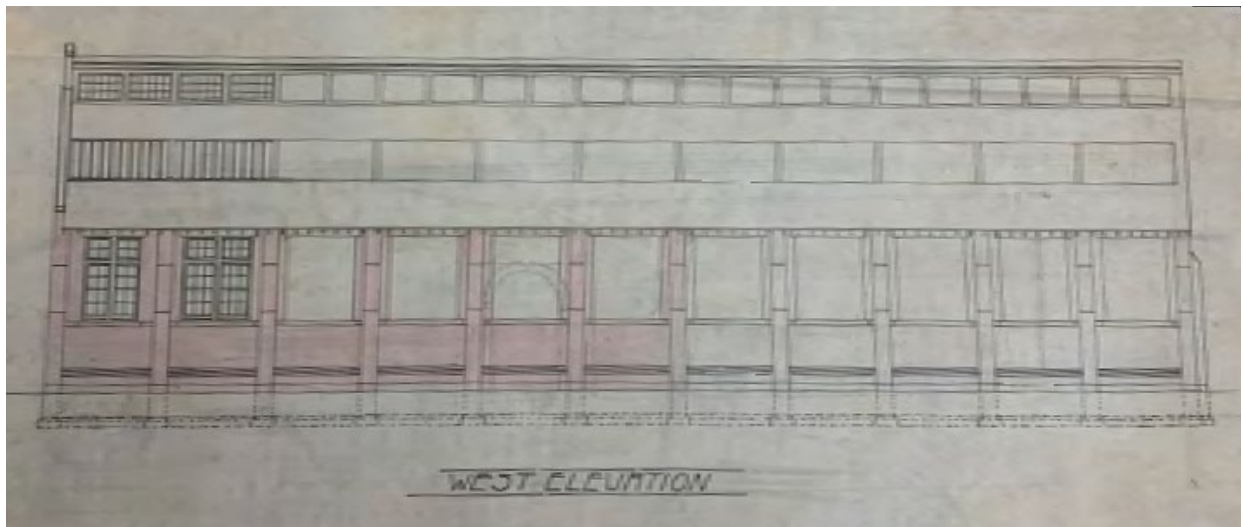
1896 original drawing by EJ Lennox of the Foundry, west elevation (EJ Lennox Fonds, Archives of Ontario)
